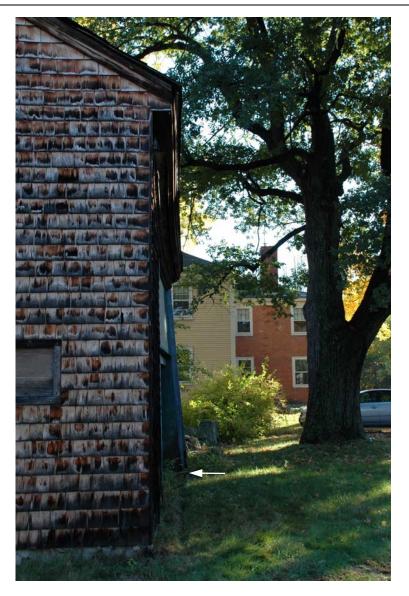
View looking east, showing the extent of movement of the south elevation due to structural deterioration.
